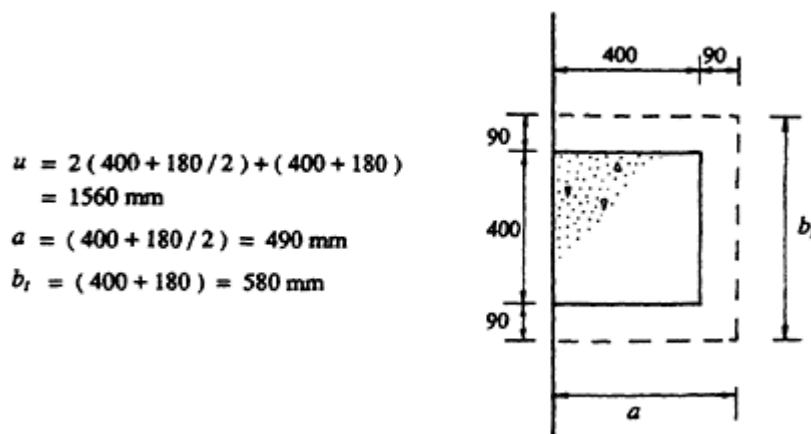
Plan view of critical section for [Example 5.5](#).
